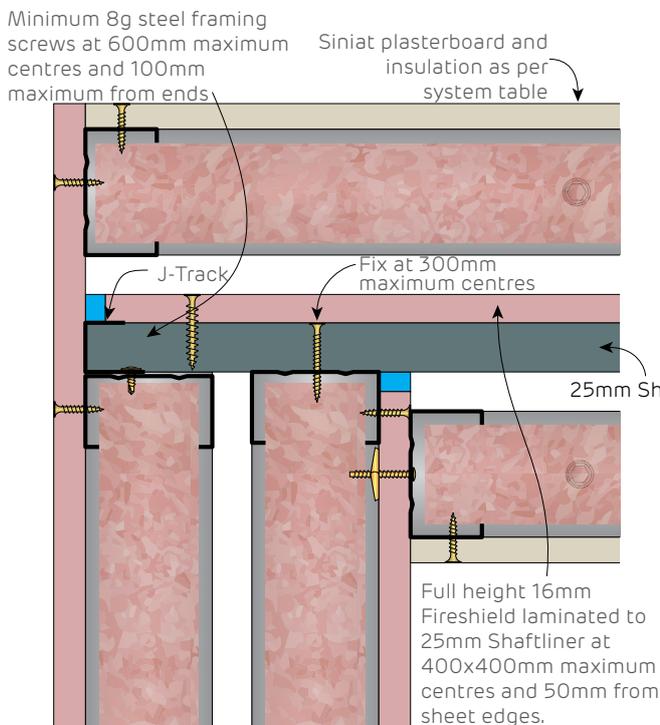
Interhome Highrise Wall Connection to Fire Rated Plasterboard Wall
